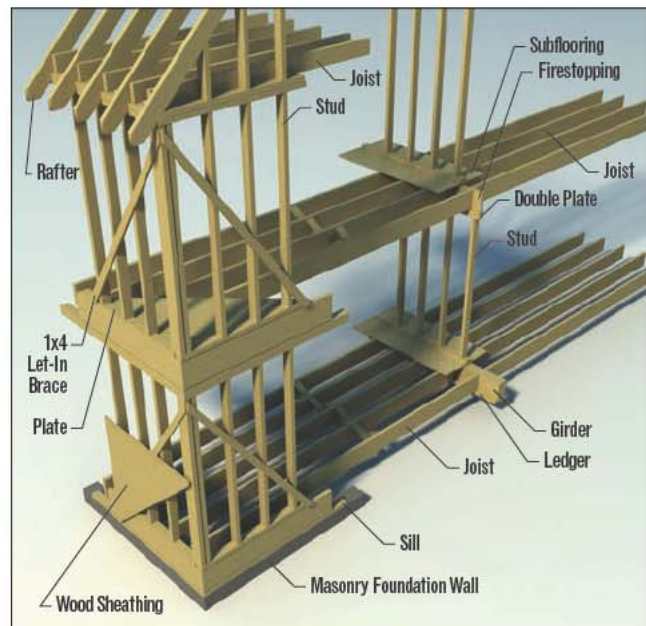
The platform-frame method of construction. Note the inherent firestopping built into the building when one floor and one story of walls are constructed at a time.
